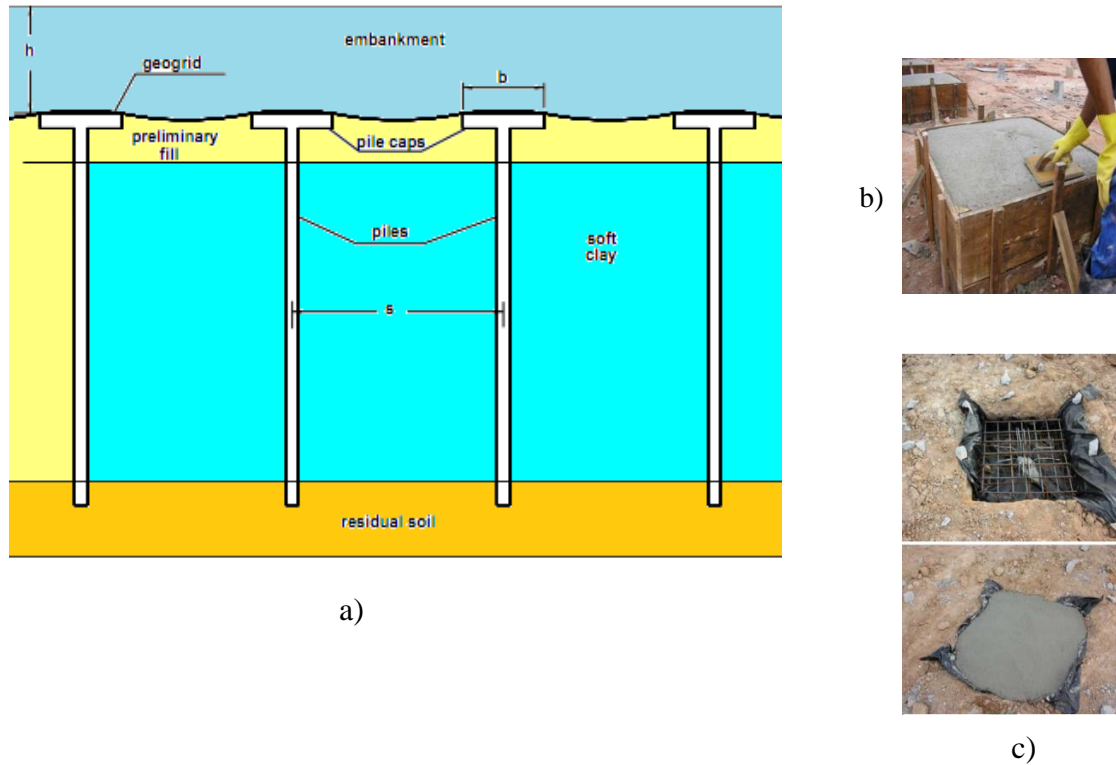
Embankment at Barra da Tijuca, a) General scheme of piled embankment, b) Pile caps above the initial fill, c) Pile caps inside the initial fill (after Almeida et al., 2008)
